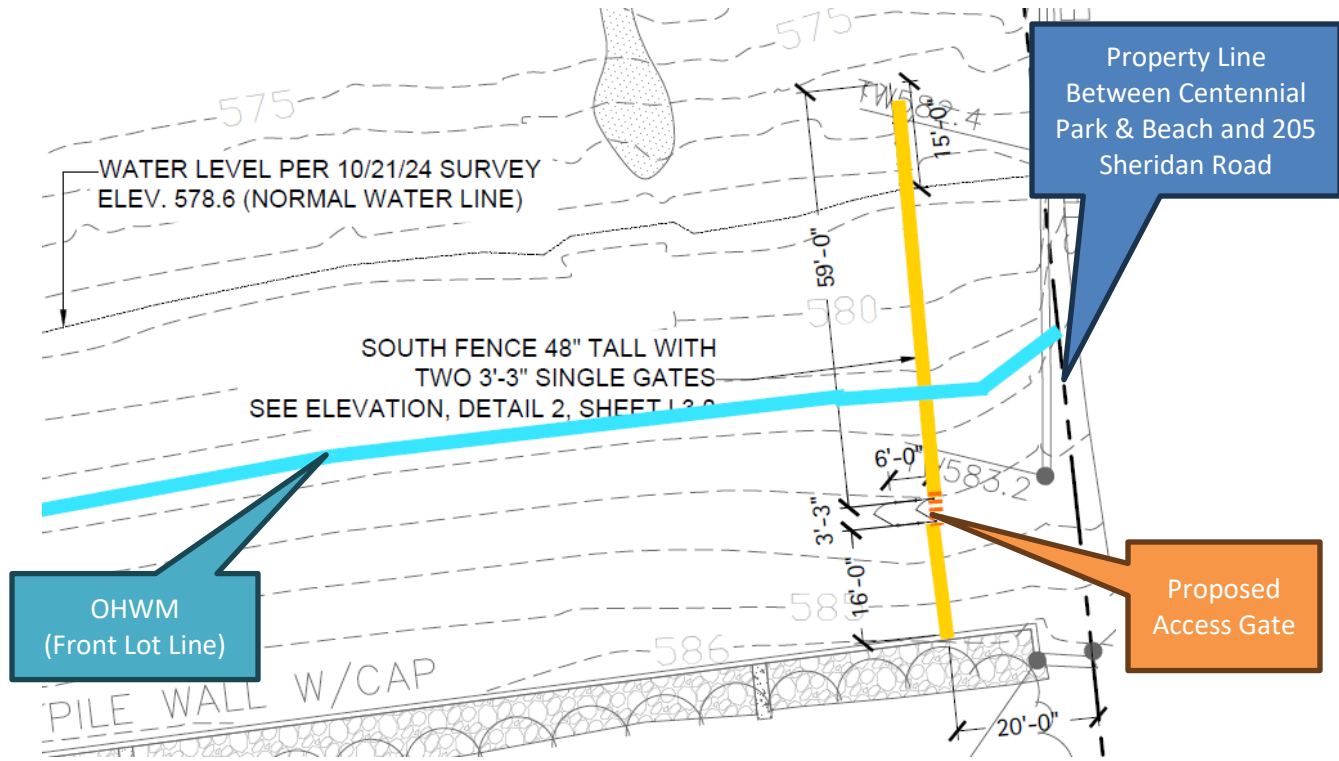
Original Plan - Proposed South Fence (Excerpt of Sheet L2.0)
